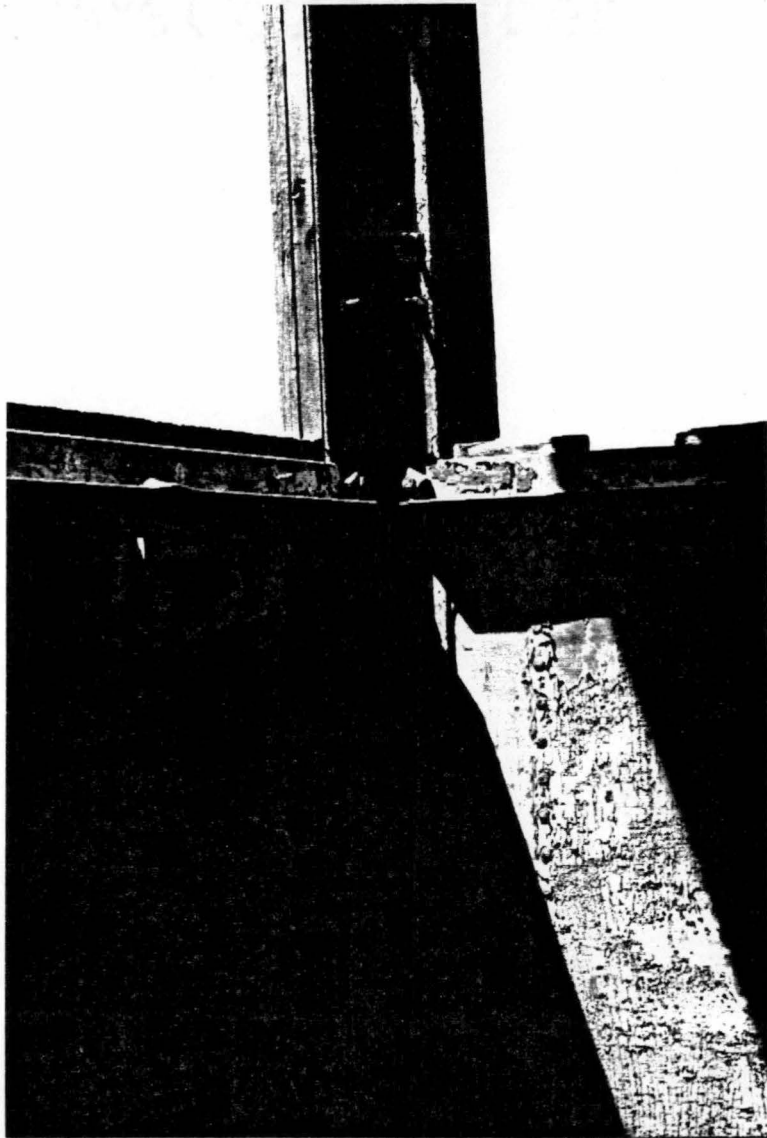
Interior of Cab. Saddleblanket Mountain Lookout Station, 1991. Source: Author.
